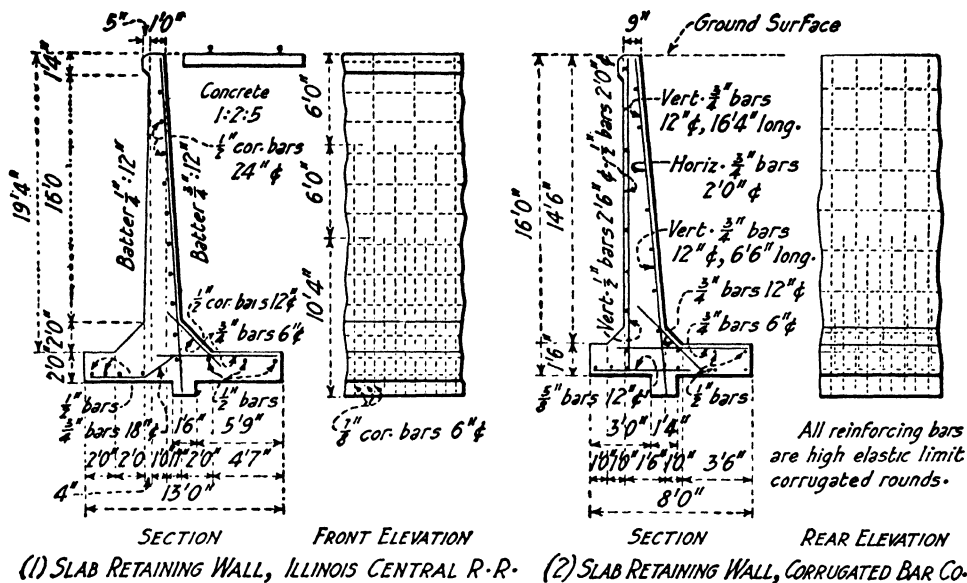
EXAMPLES OF REINFORCED CONCRETE RETAINING WALLS.
